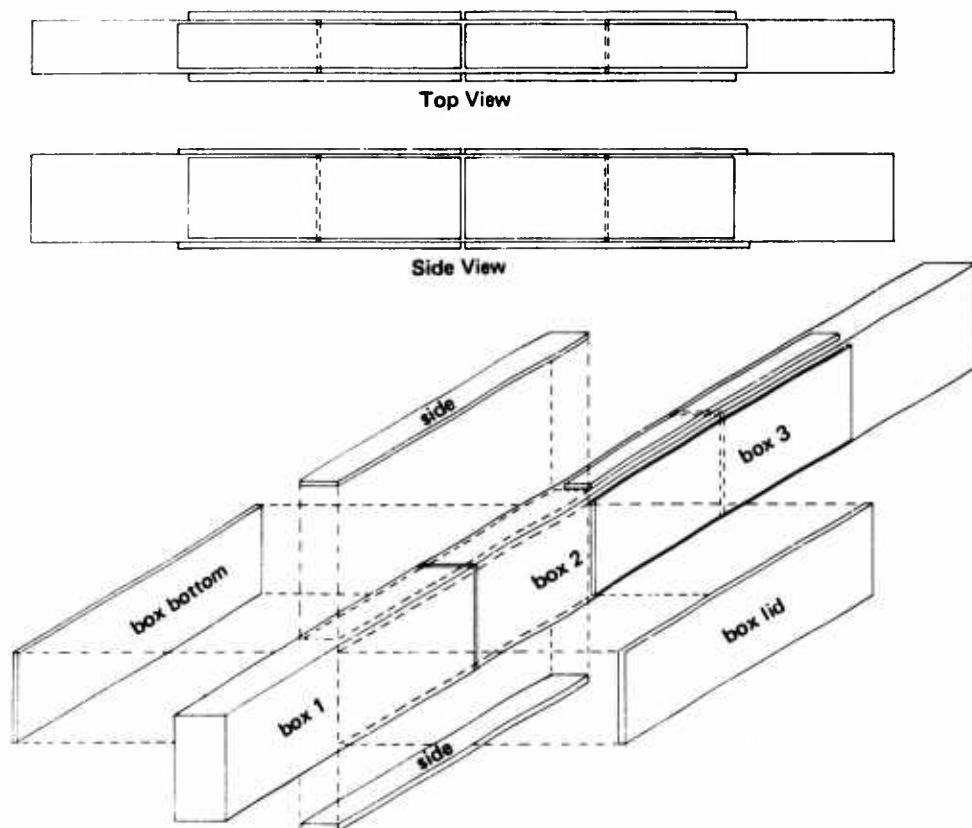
Construction plan for beam made from three 106-mm ammunition boxes (10-foot clear span).
